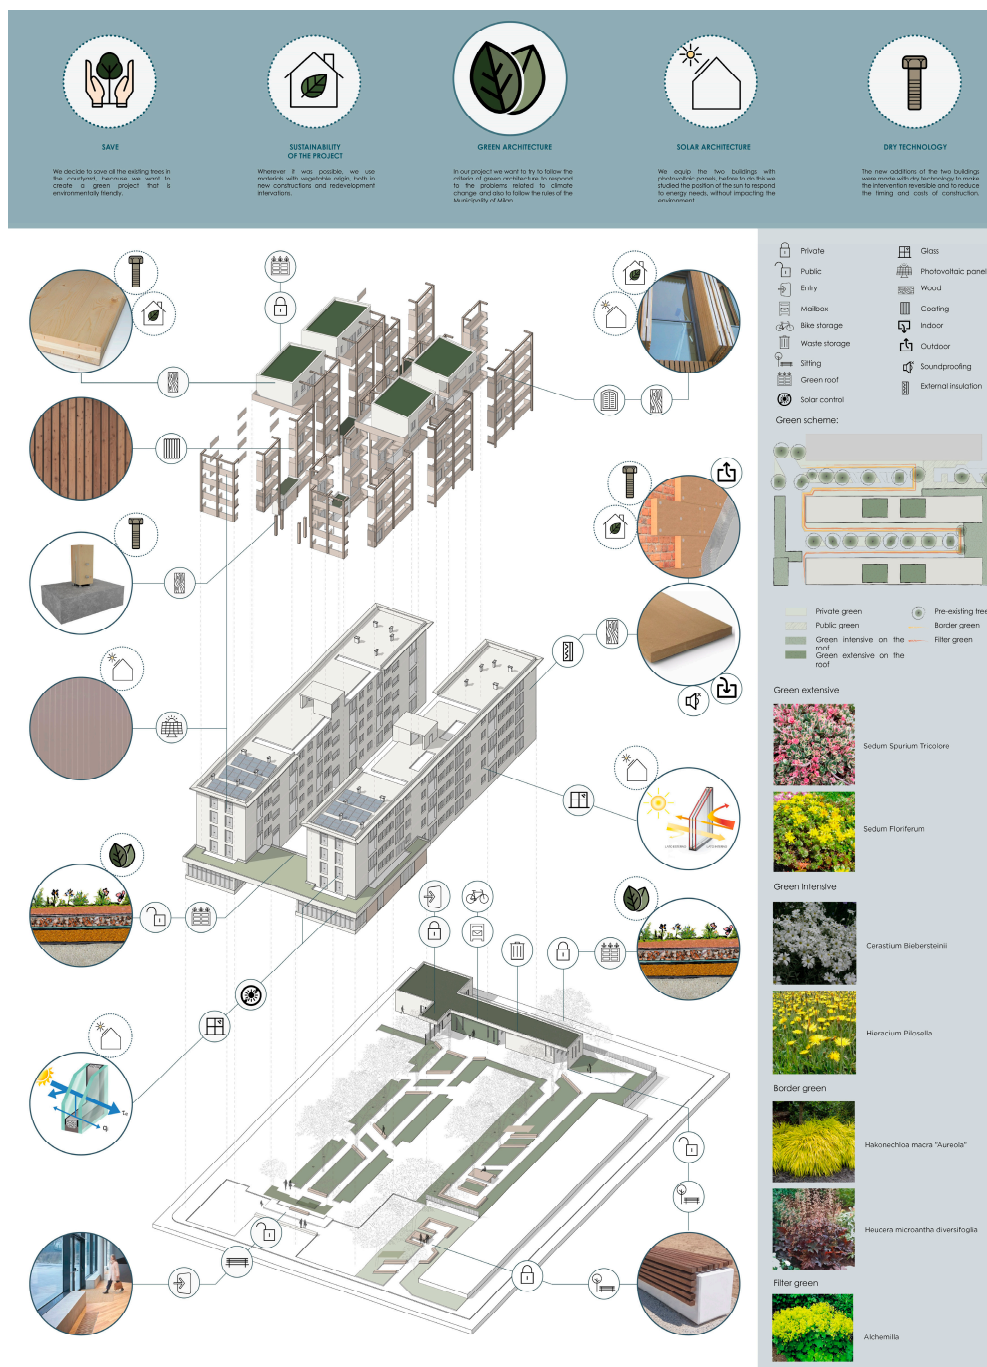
Floor plan of the architectural project "Starting from San Siro" (F. Airolidi, A. Rili, V. Scaraffia)
